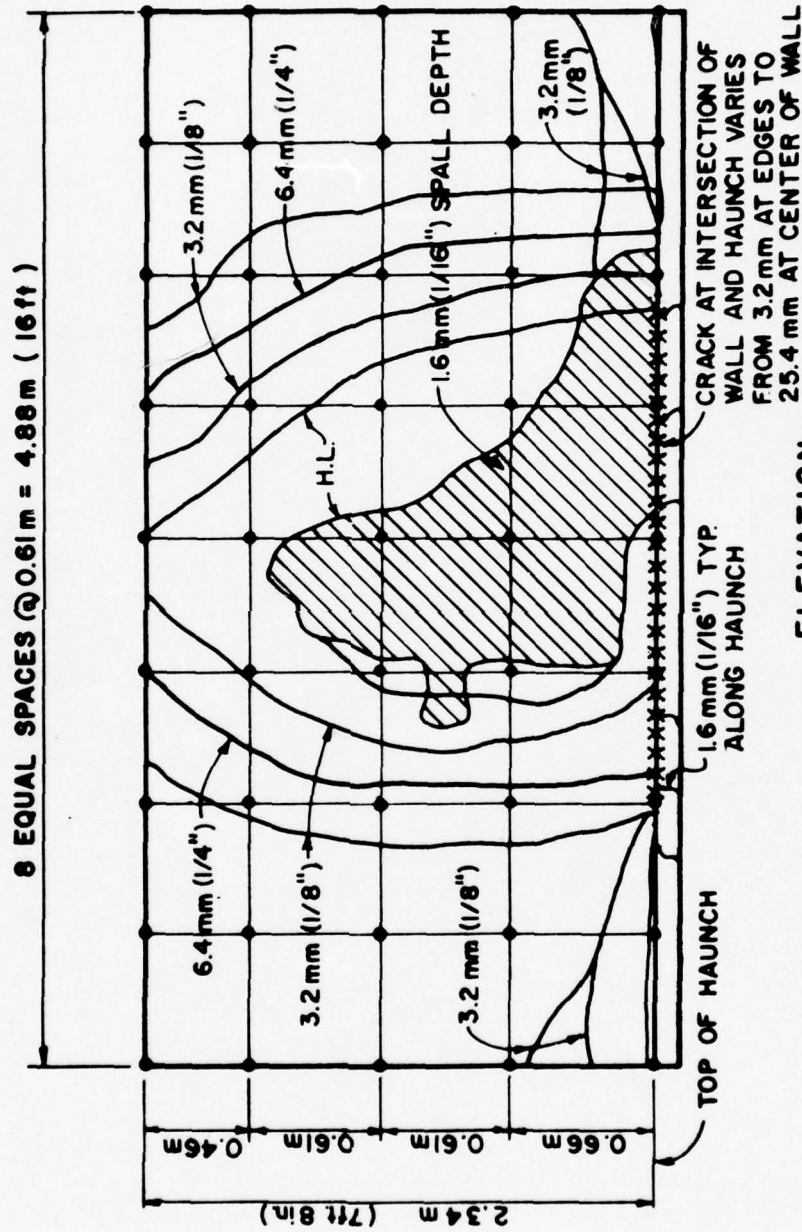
Crack patterns, Wall No. 1, Test No. 2
